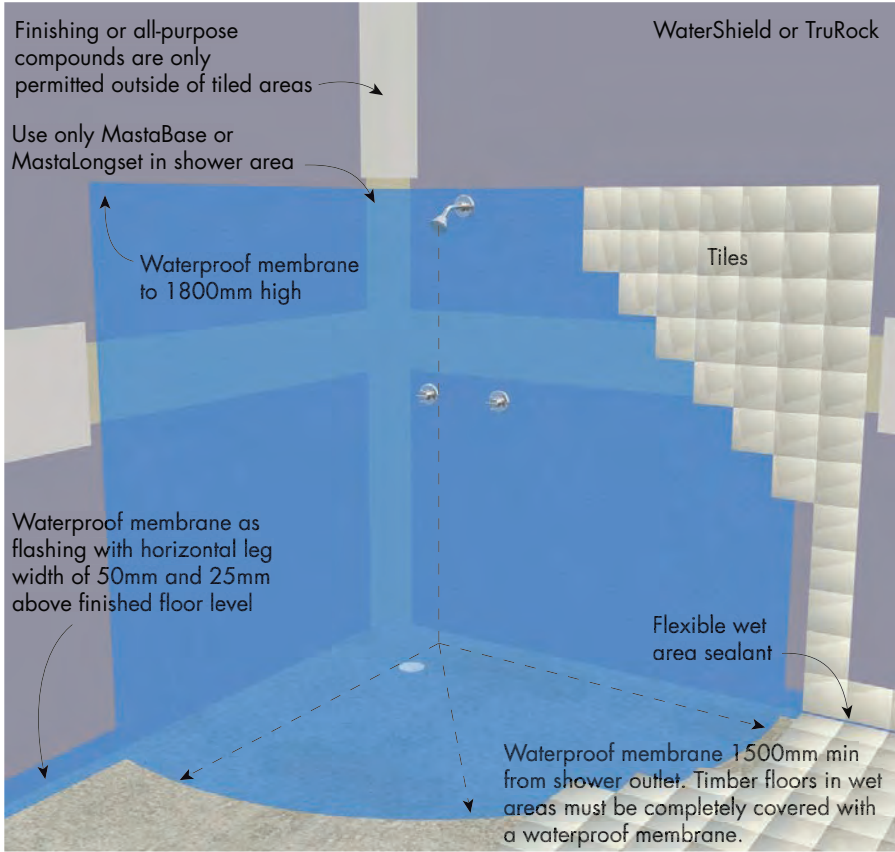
Internal in situ tray for unenclosed shower on concrete or compressed fibre cement floor
